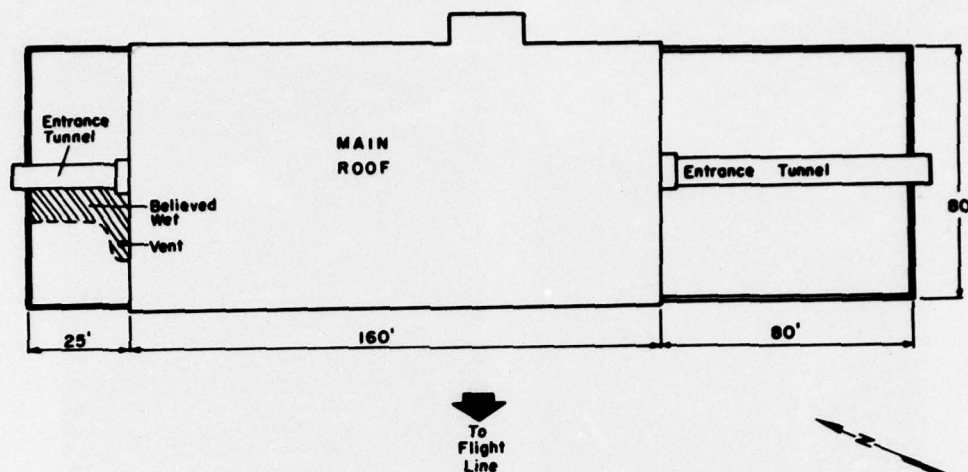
Plan view of Building 205. The main roof is one story high while the four side roofs are about 2 ft below ground level. They are separated from the ground by a perimeter wall which projects a few inches above grade.
